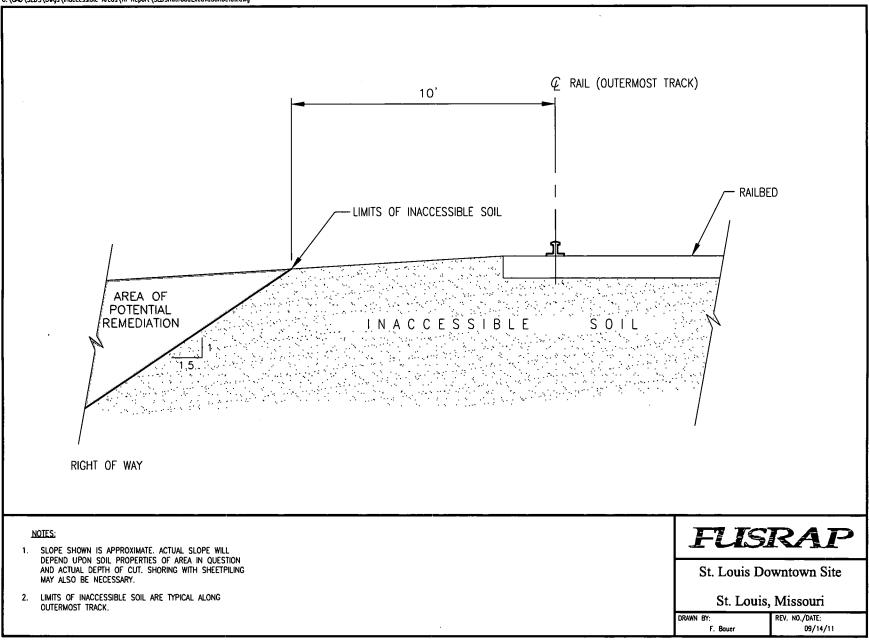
Typical Rail Bed Inaccessible Soil Profile
